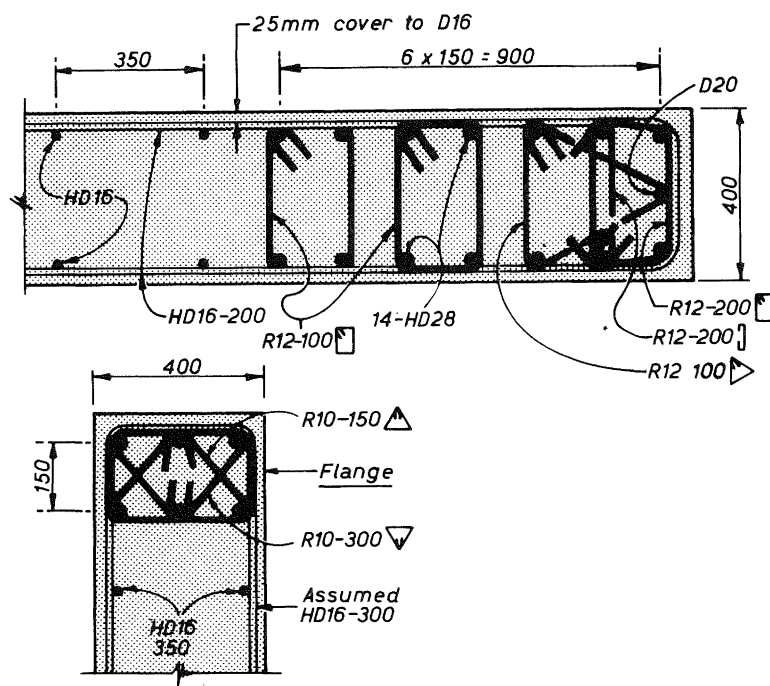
Arrangement of Transverse Reinforcement in the Critical Regions of the Example Shear Wall Section.
